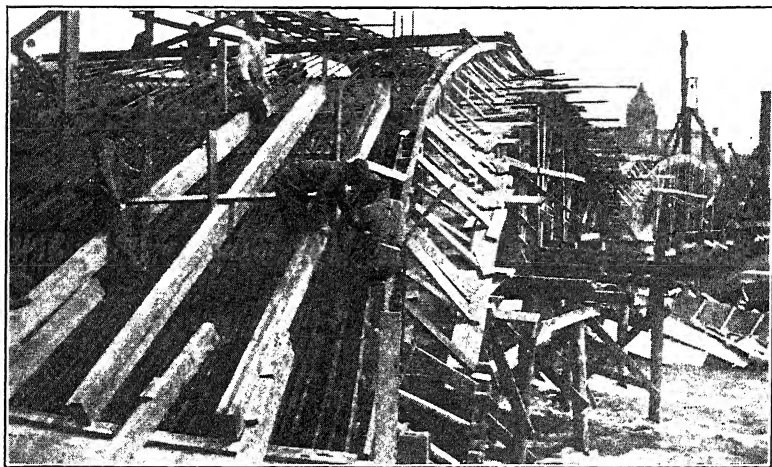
Longitudinal bulkhead used in arch-ring construction.
